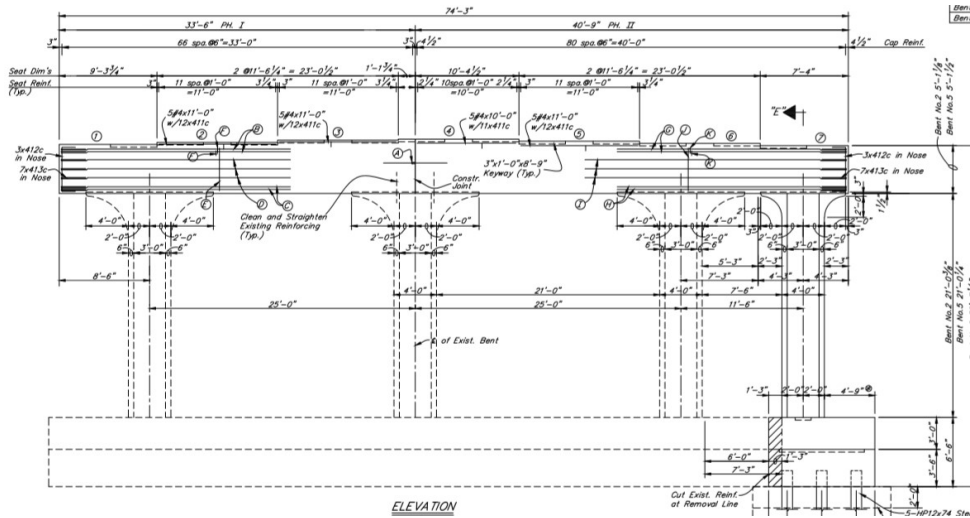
Transverse Elevation of Interior Pier 2 (NBI 18790) (2014)
